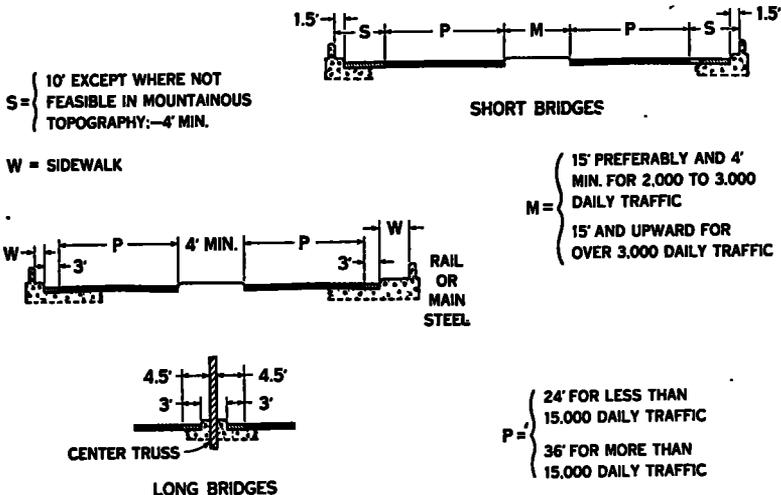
Single Structures—4- and 6-Lane Roads—Rural
